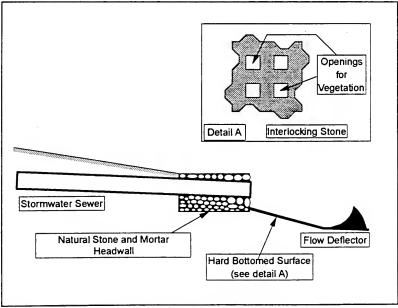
Dry Pond Inlet and Hard Bottom Forebay
